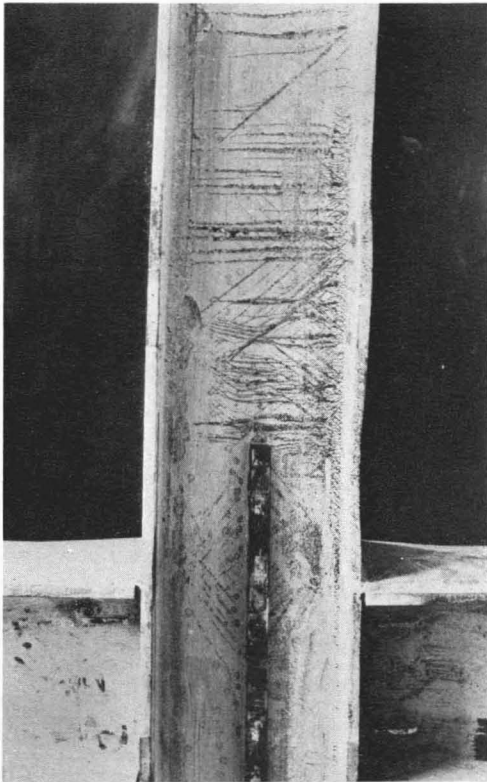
(a) Welded top plate and seat angle connection after column test.
